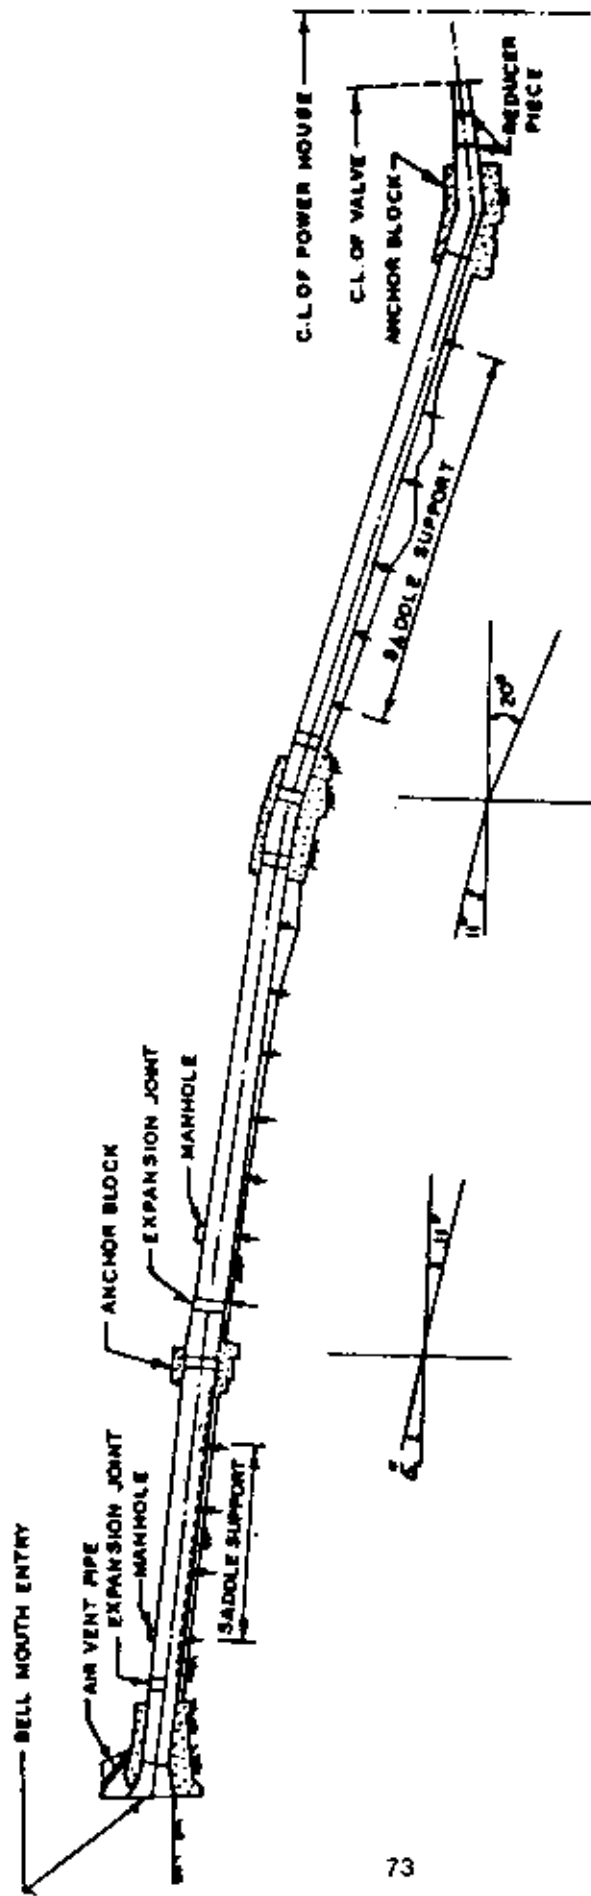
TYPICAL I - SECTION OF PENSTOCK PROFILE
